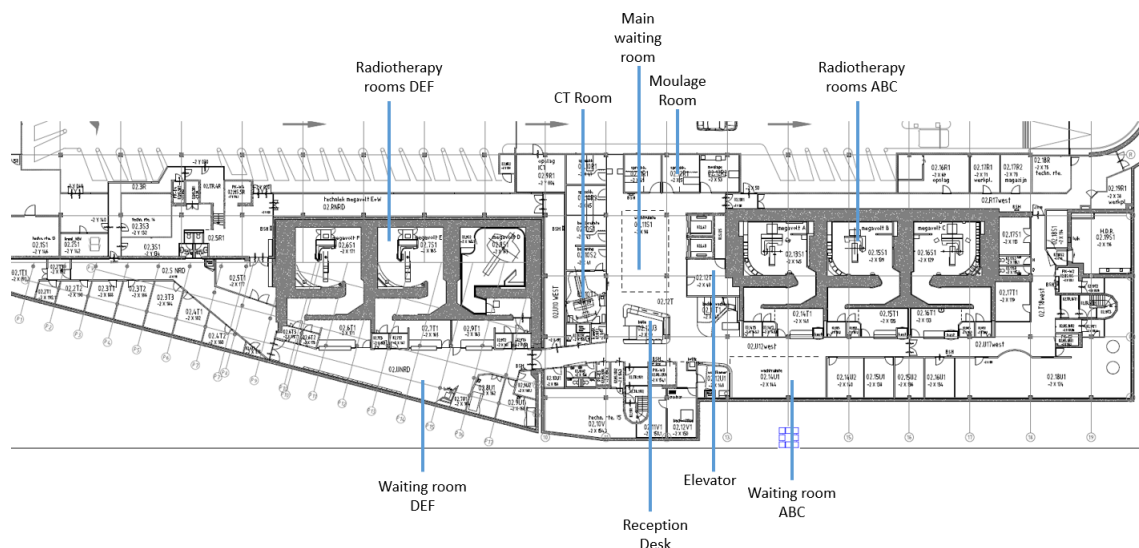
Plan of the radiotherapy department (Floor -2)
